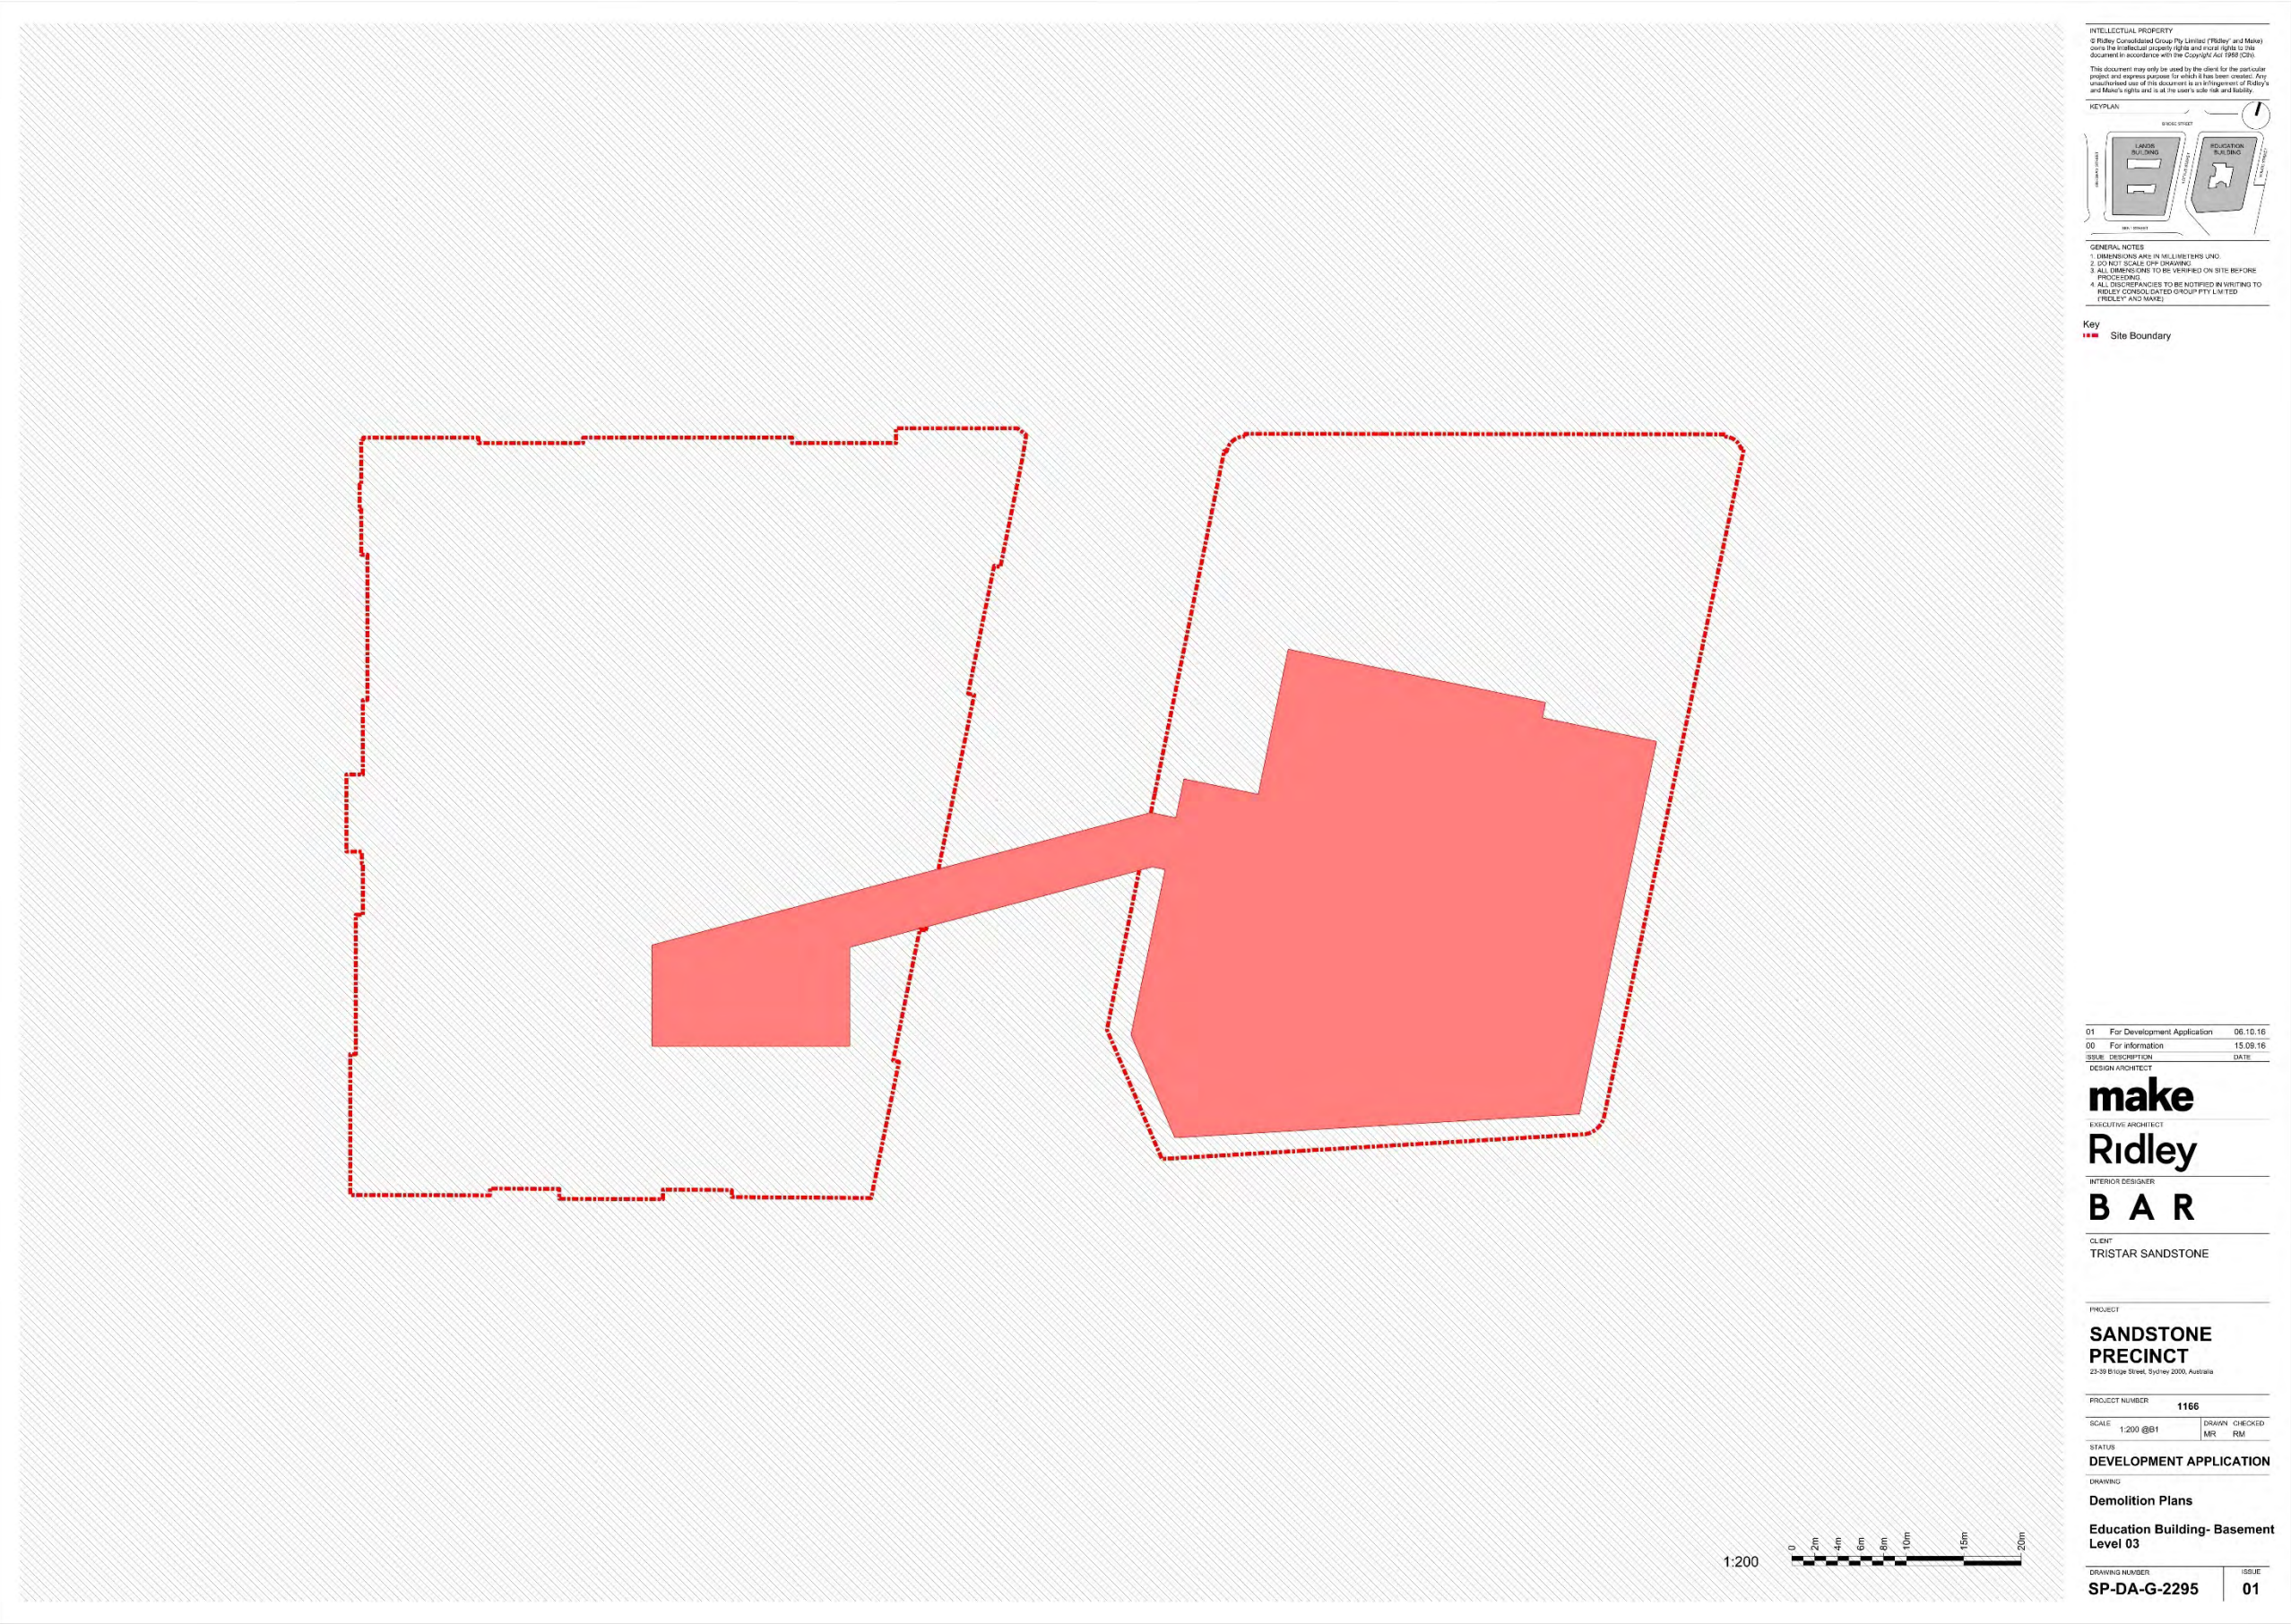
Demolition Plans—Basement 3 and Subterranean Link (c. 8-12m below current ground surface). (Source: Make & Ridley, Drawing SP-DA-G-2295 14.10.16)
